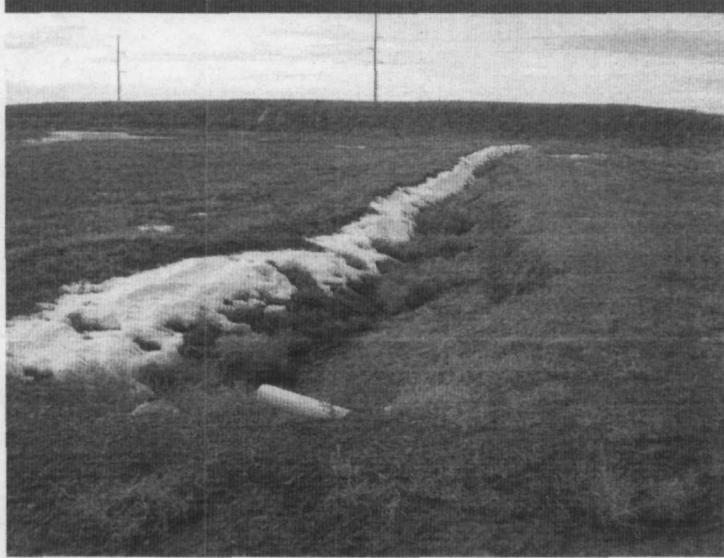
Surface water drainage ditch with planned NPDES outfall pipe.
